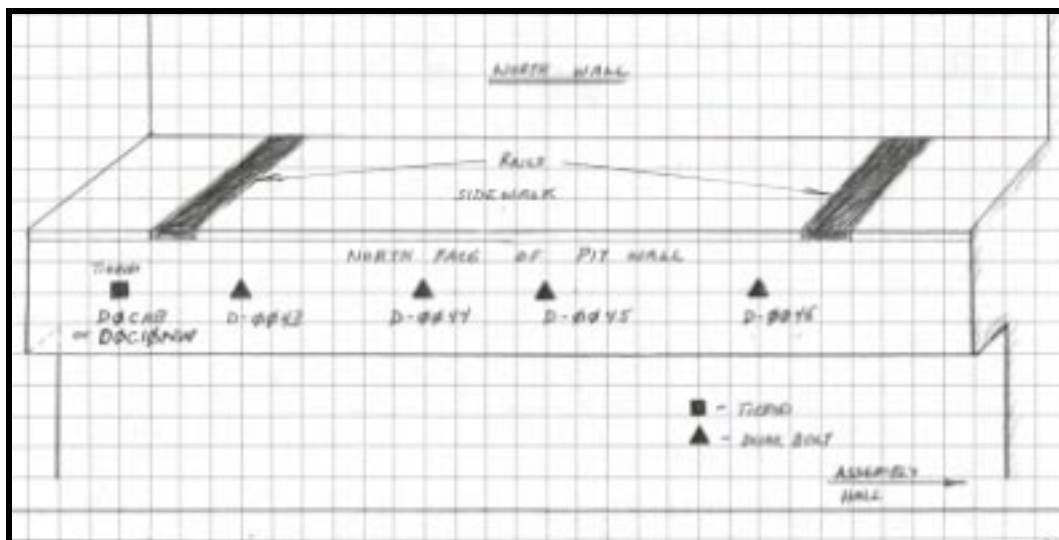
North Face of Pit Wall of Collision Hall with Controls
